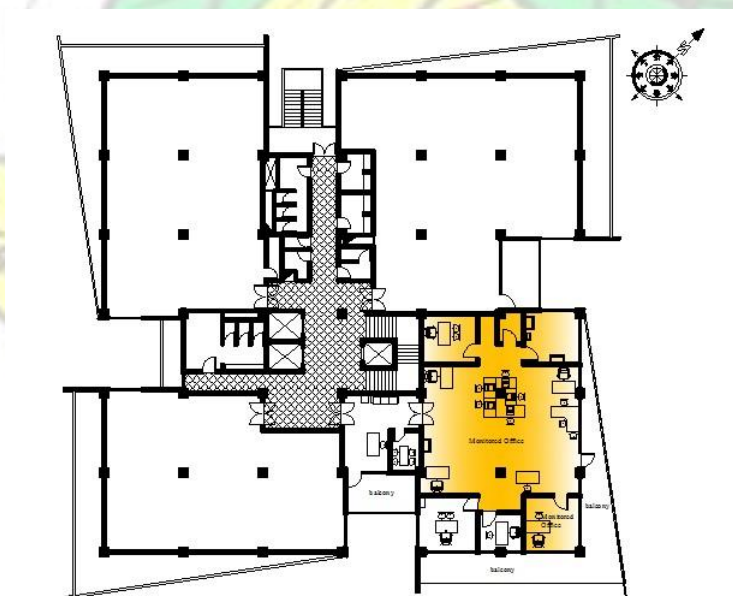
Schematic Plan of Offices on the 7th Floor in the R. T. Building.
